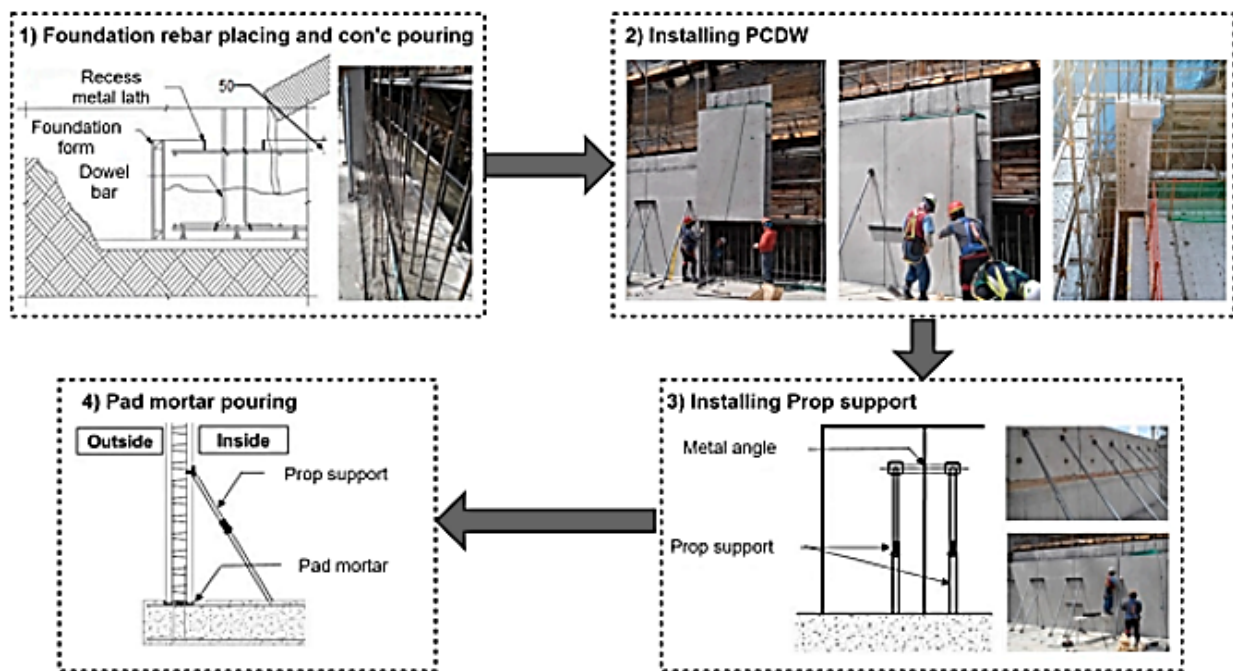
An illustration of a precast concrete double wall (Kim et al., 2020)
